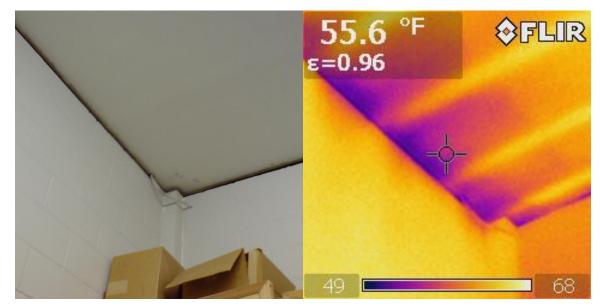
Infiltration Detection—Wall and Ceiling Seam
